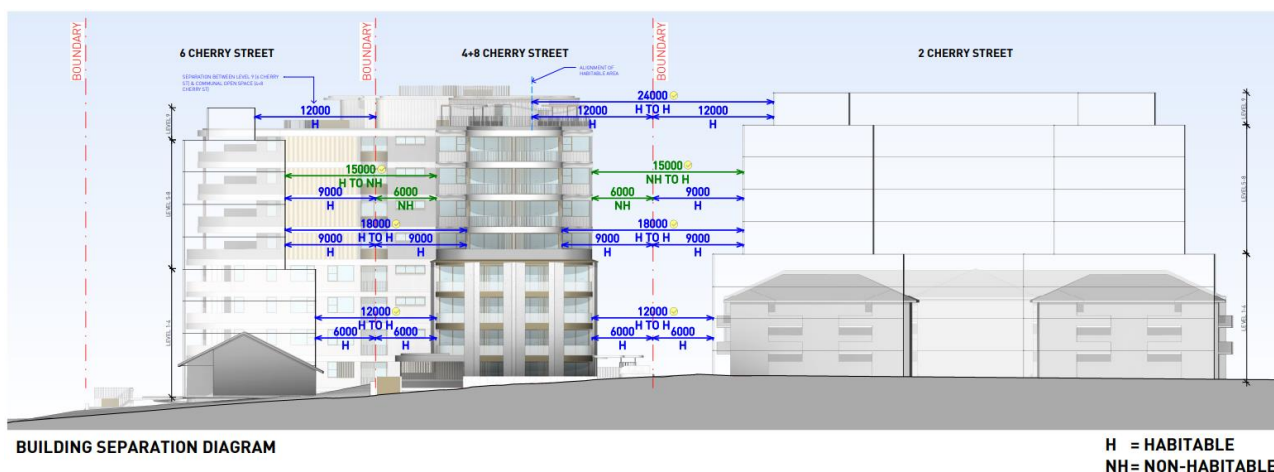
Building Separation Diagrams (Source: Giles Tribe)
